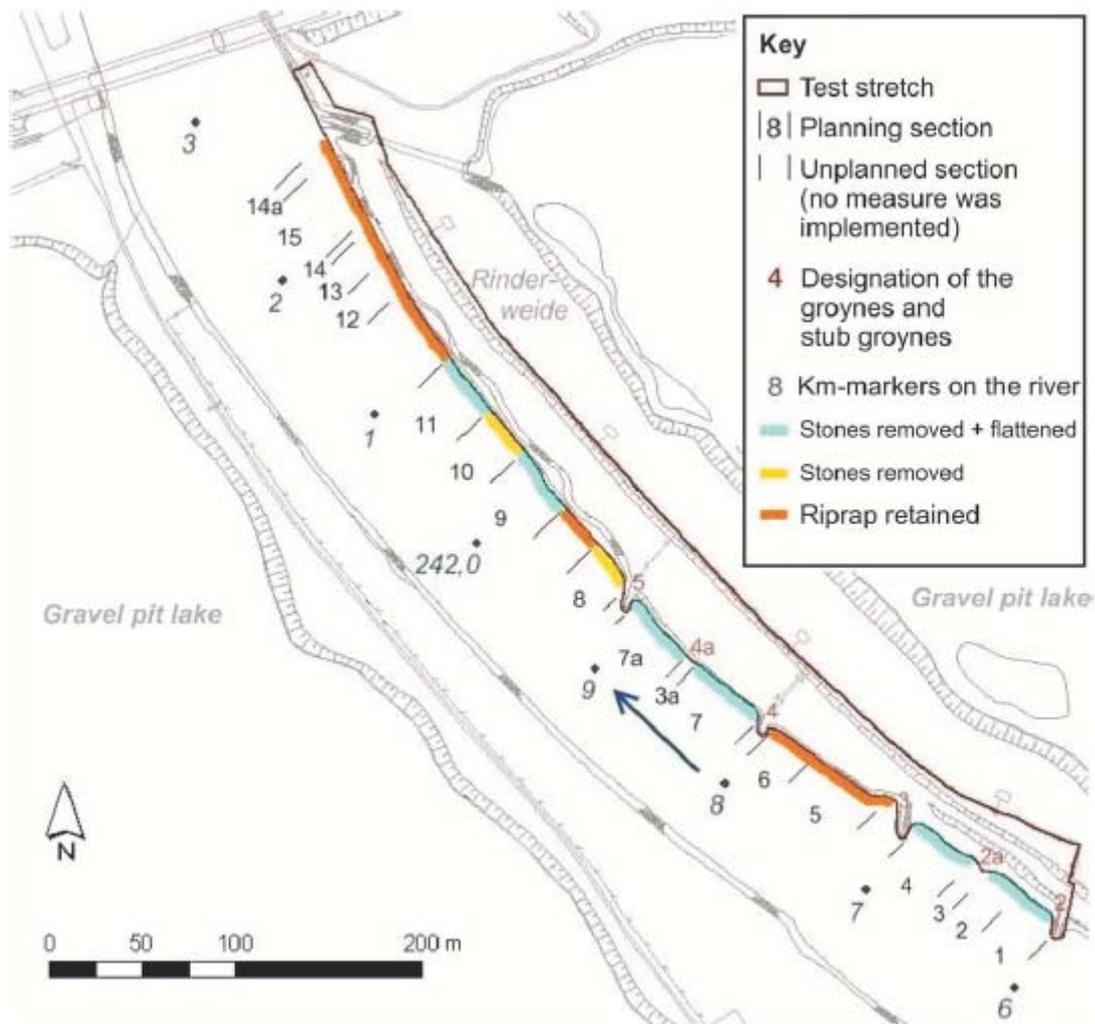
The test stretch between Km 241.55 and 242.30 with the planning sections
